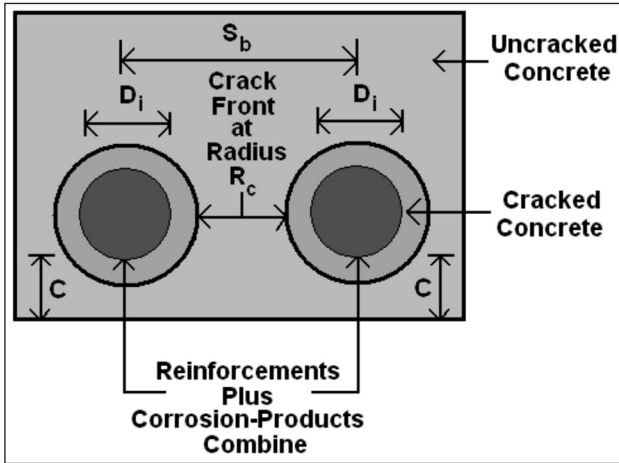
Crack propagating condition for concrete block with two reinforcing bars due to reinforcement corrosion (Bhargava 2008)
